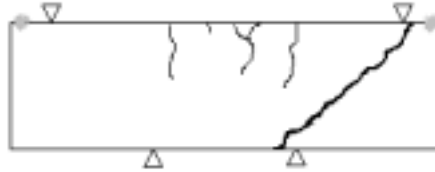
Typical crack patterns and failure mode for beams reinforced with Replark® for shear at 90°.
